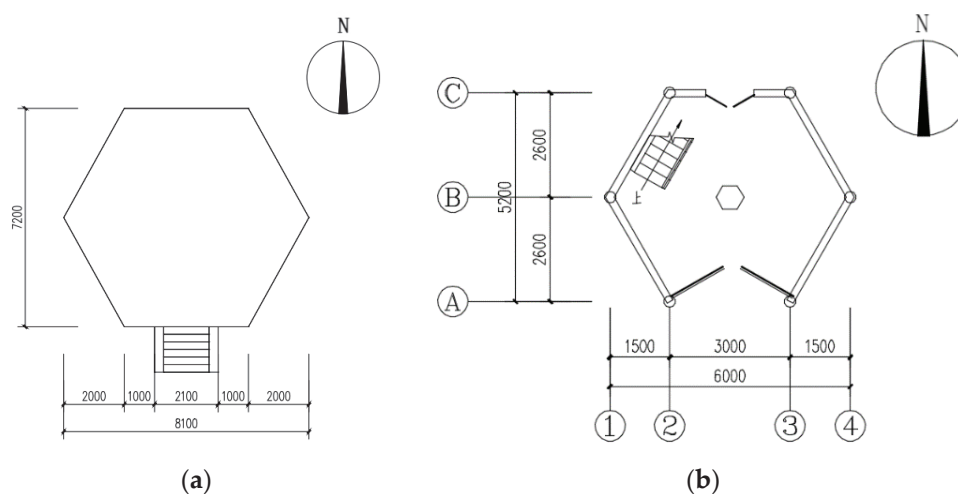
The structure of Caiyunjian Tower. (a) Plan view of the platform; (b) plan view of the first floor.
